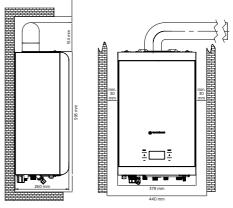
Boiler minimum dimensions in the cabinet \*Minimum clearances required for servicing
